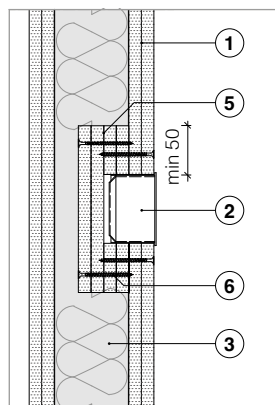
Electric socket mounting – enclosure made of NORGIPS plasterboards
